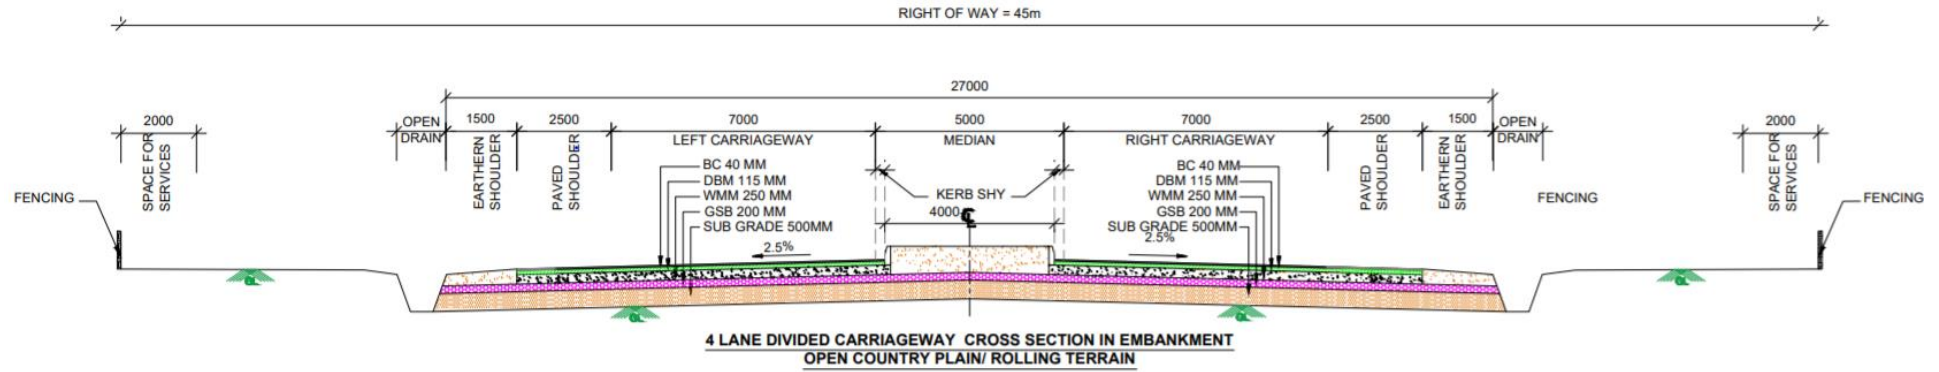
Cross section of the project (4 lane divided carriageway in embankment)
